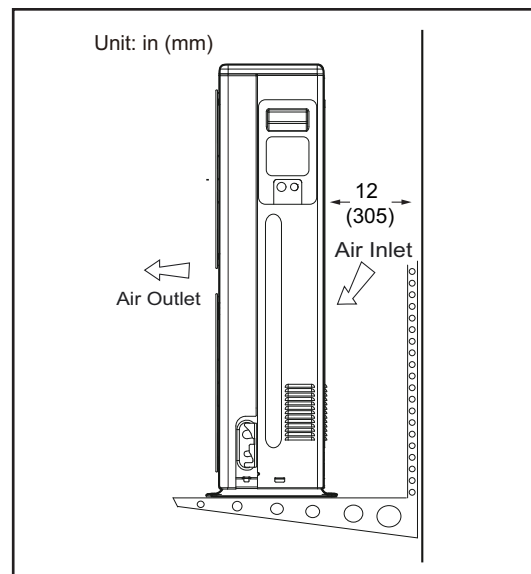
Securing Outdoor Unit to Wall-Mounted Brackets
